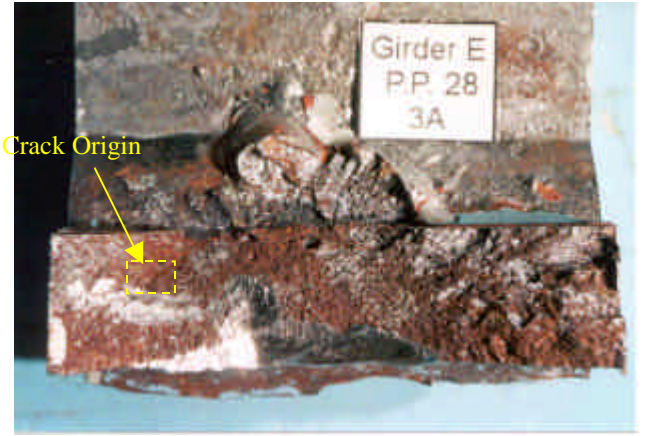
Opposing Web Crack Surface at the Fracture Origin Attached to the Vertical Connection Plate (Girder E P.P. 28)
